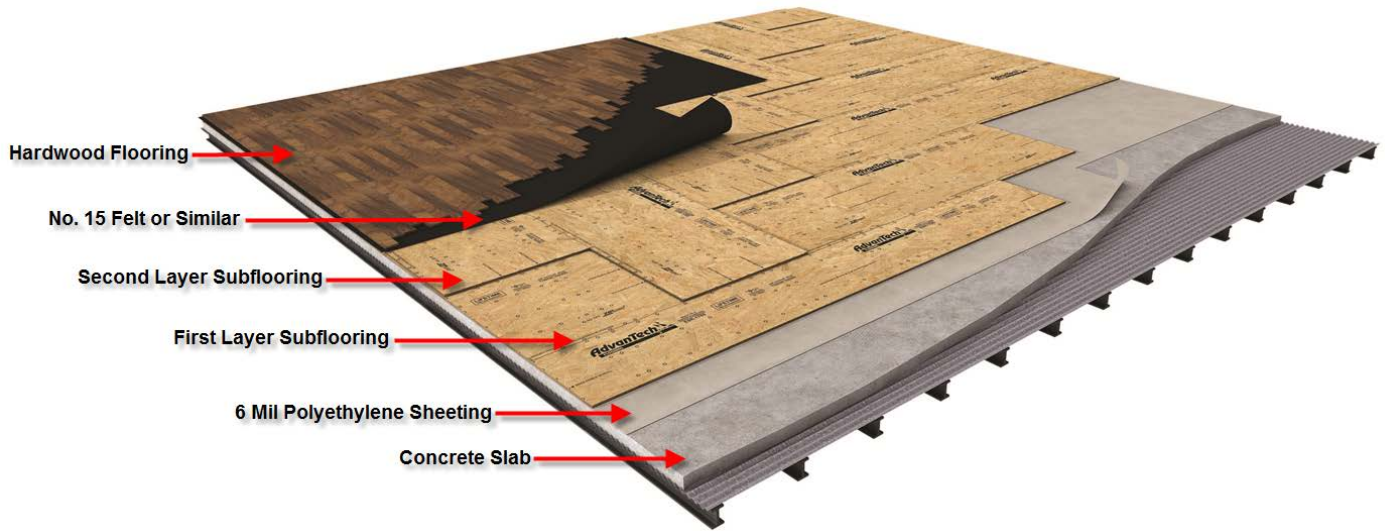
Typical 2-Layer Floating Subfloor Assembly with Hardwood Flooring
